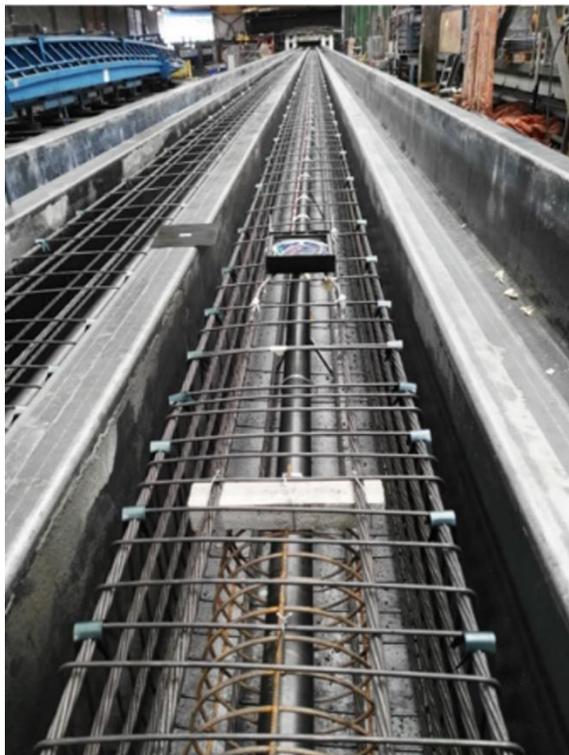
Instrumentation and compressive load tests on precast driven piles (part of Rotterdam)
